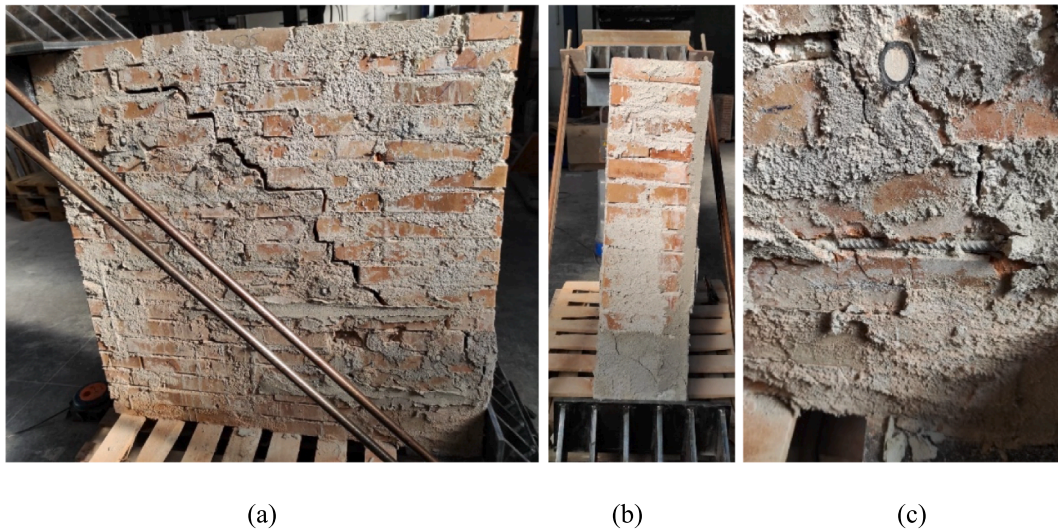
Repaired MAT-06-S wall (unreinforced side): (a) Failure mode, (b) Lateral view, (c) detail of the ejection of the mortar cover near the stainless steel bars.
